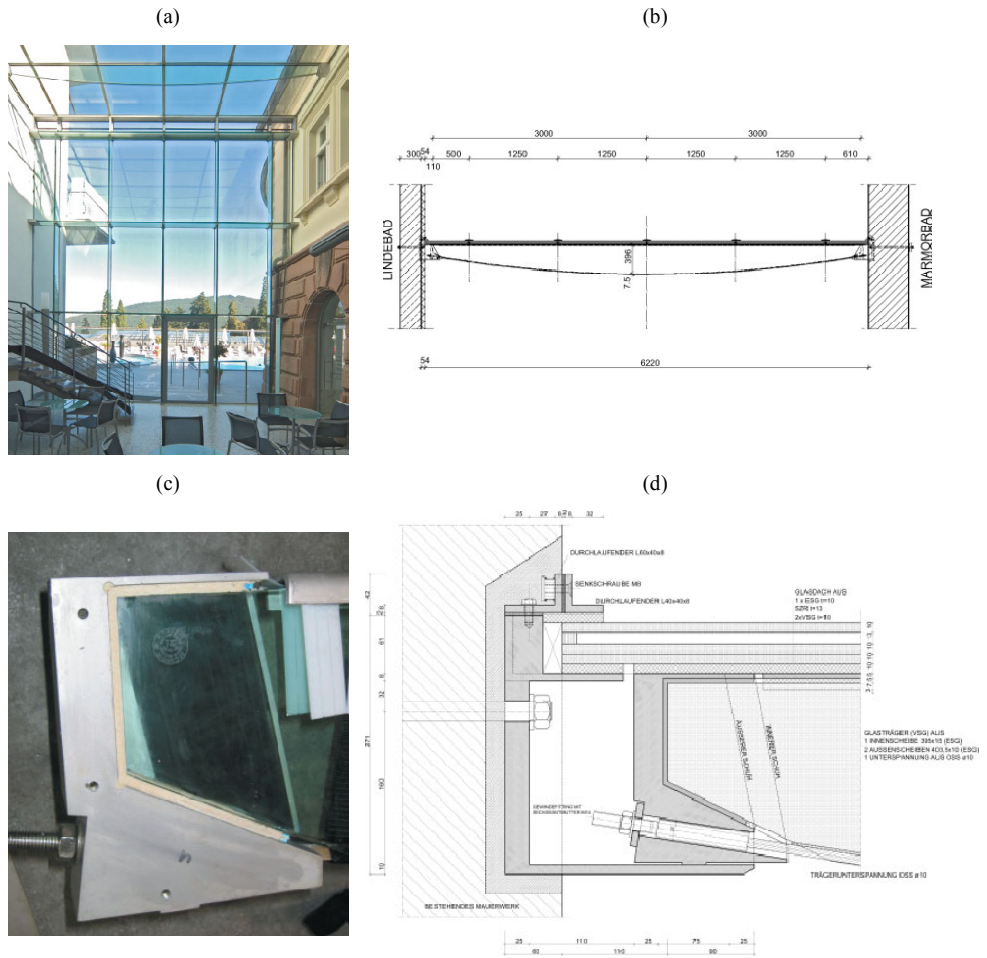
Post-tensioned glass beams applied in a glass roof covering, Badenweiler [Schober, Gerber & Schneider, 2004]; (a) photograph of the structure; (b) overview of the post-tensioned beam; (c) post-tensioned heads/shoes at the beam ends; (d) cross section at support, including the post-tensioning beam ends.
